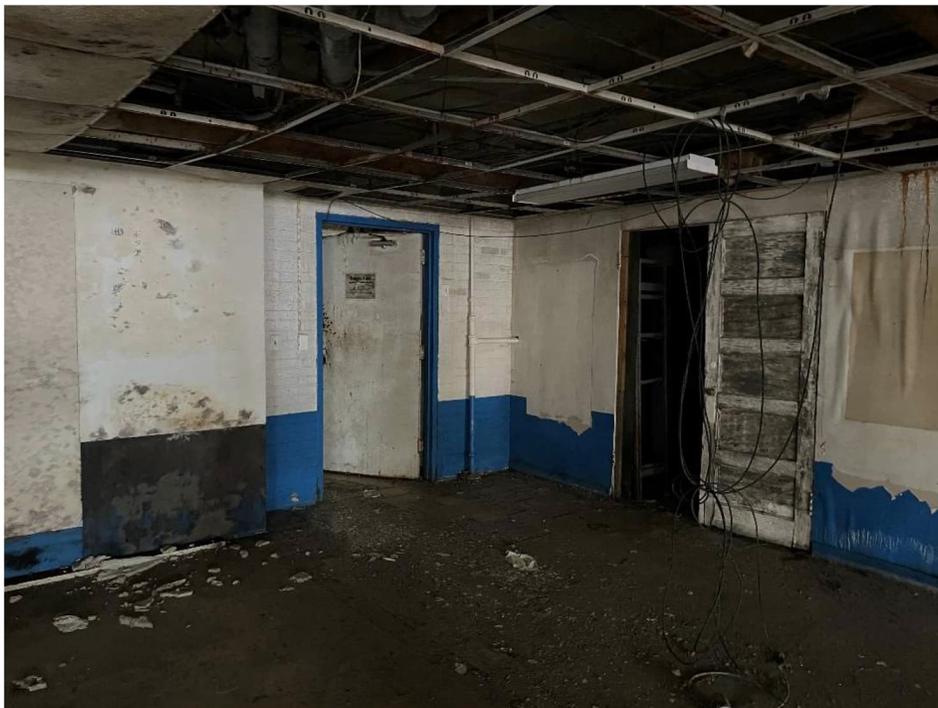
View of water damaged flooring in Unit 318 on third floor
